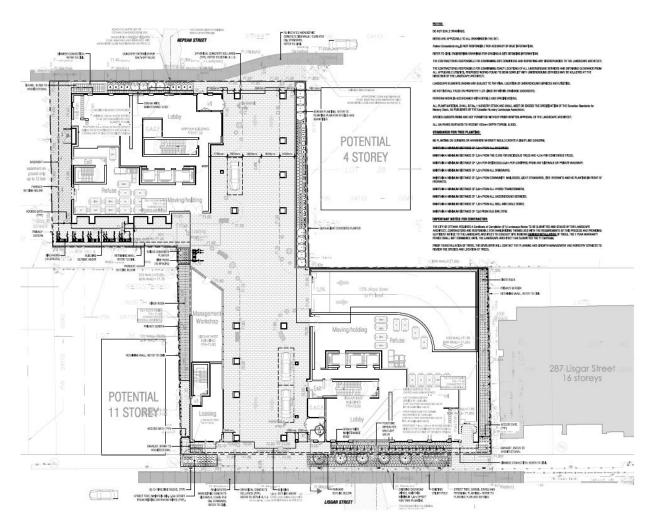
Landscape Plan View of the two towers with two-way drive isle and an internal woonerfdesigned courtyard. The open two-lane drive isle that links Lisgar and Nepean helps mitigate the restricted front yard setback of the towers. Source: Graziani & Corazza Architects
